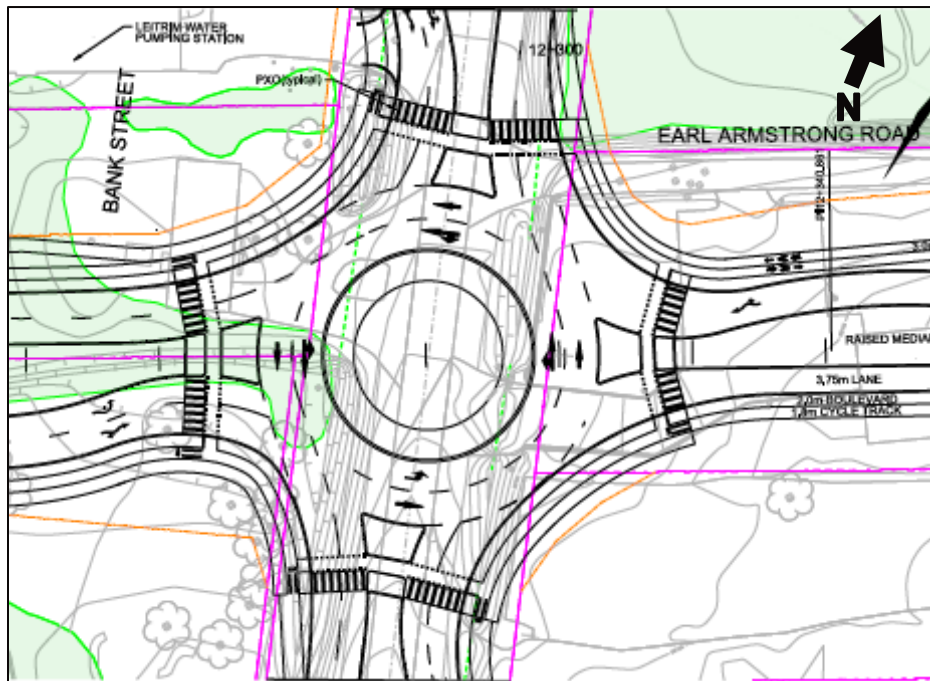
Future Bank Street & Earl Armstrong Road Roundabout
